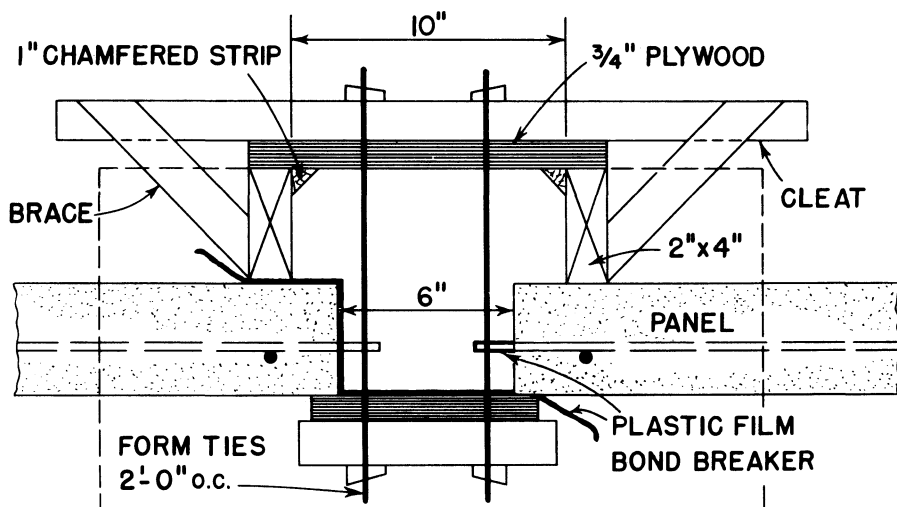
Forms for concrete columns between tilt-up concrete panels.
